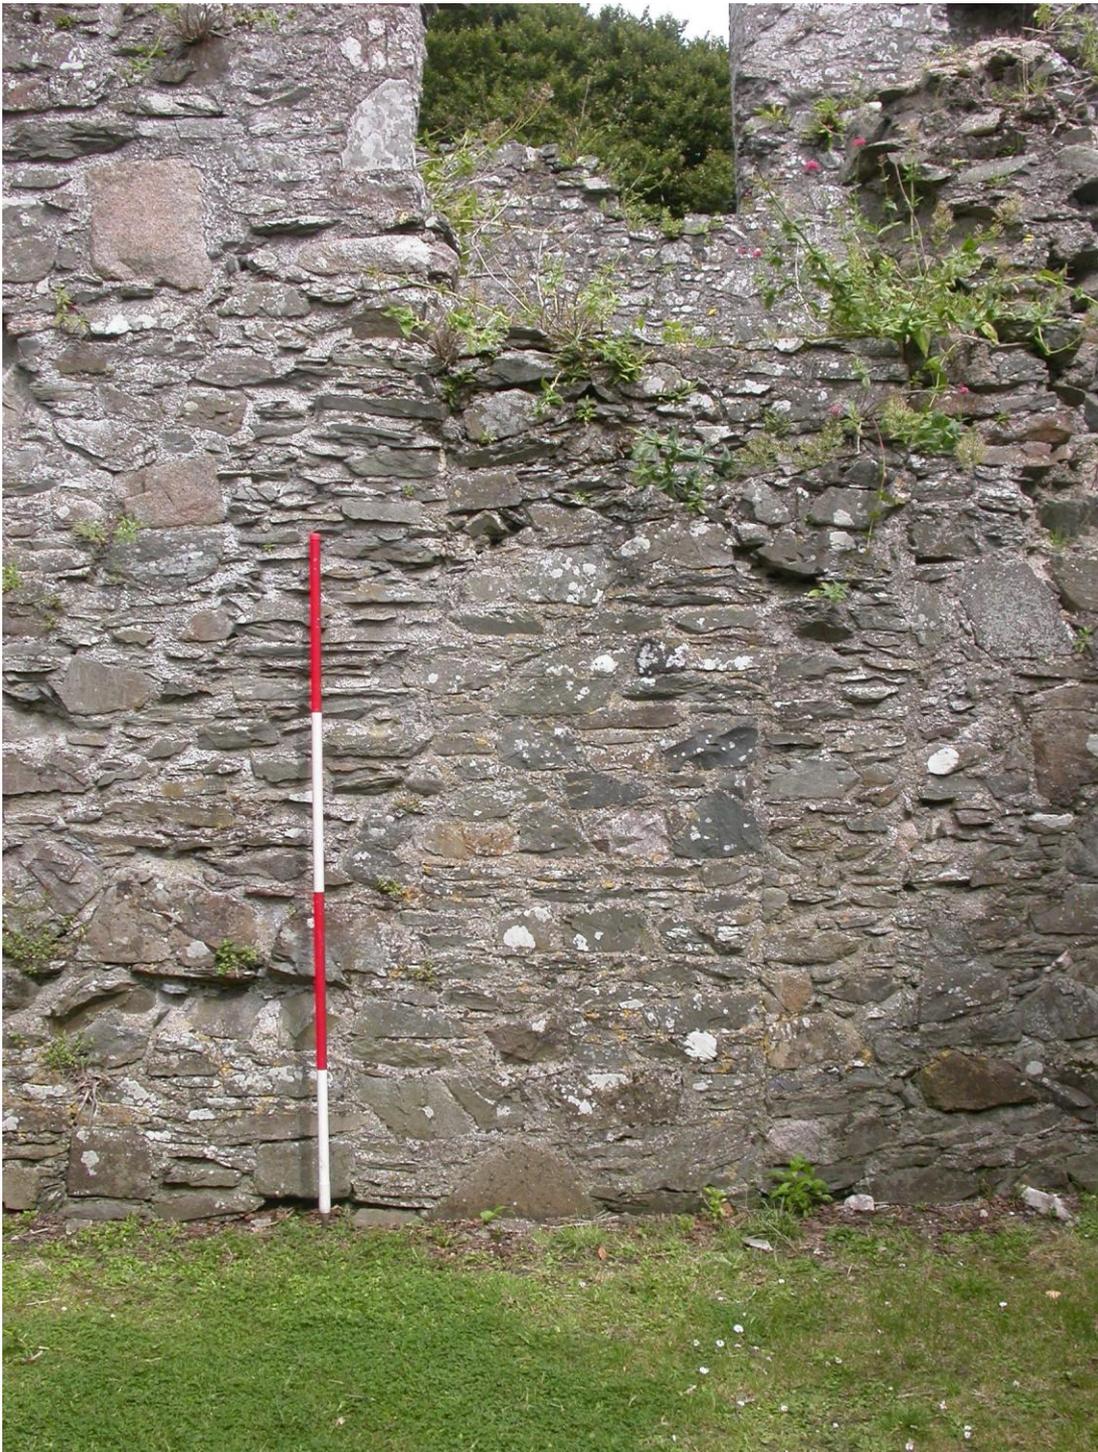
Blocked opening that extends to ground level in the west wing's eastern wall (AD), looking east. Scale 2.0 metres.
